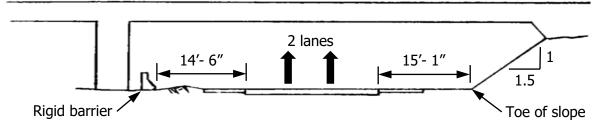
Bridge elevation view of horizontal clearances for a 2-lane, 1-way highway feature below the bridge, with a rigid barrier.
